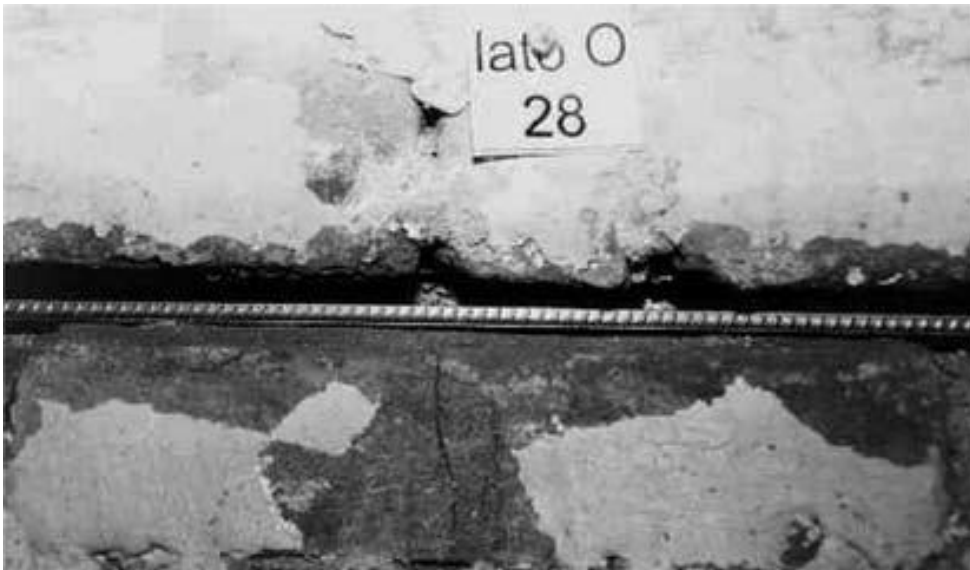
On-site insertion of reinforced bars into joints
